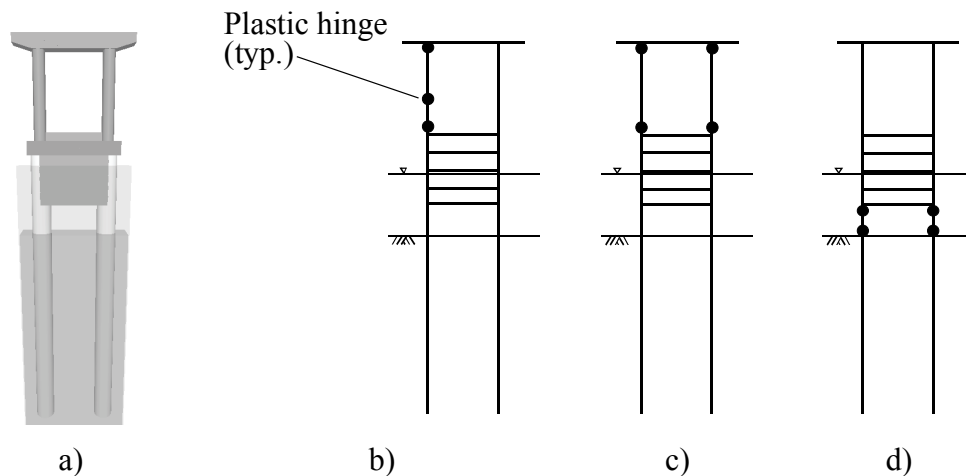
Collapse mechanisms considered in the probabilistic simulations conducted for the BLT-CHA case. a) Structural configuration; b) Collapse mechanism for direct pier column impact; c) Pier column collapse mechanism; d) Drilled shaft collapse mechanism
